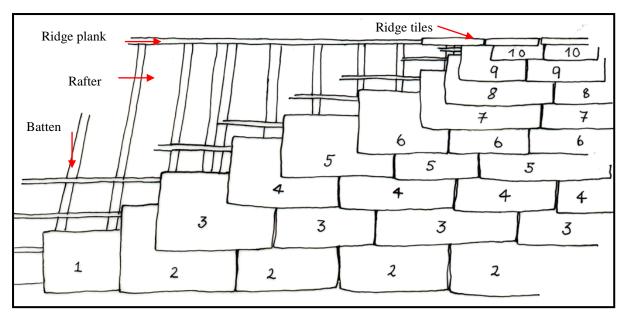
Diagram of simple vernacular roof type with roof of collared rafters, showing rafters, battens, ridge tiles & stone slates laid to diminishing courses.
